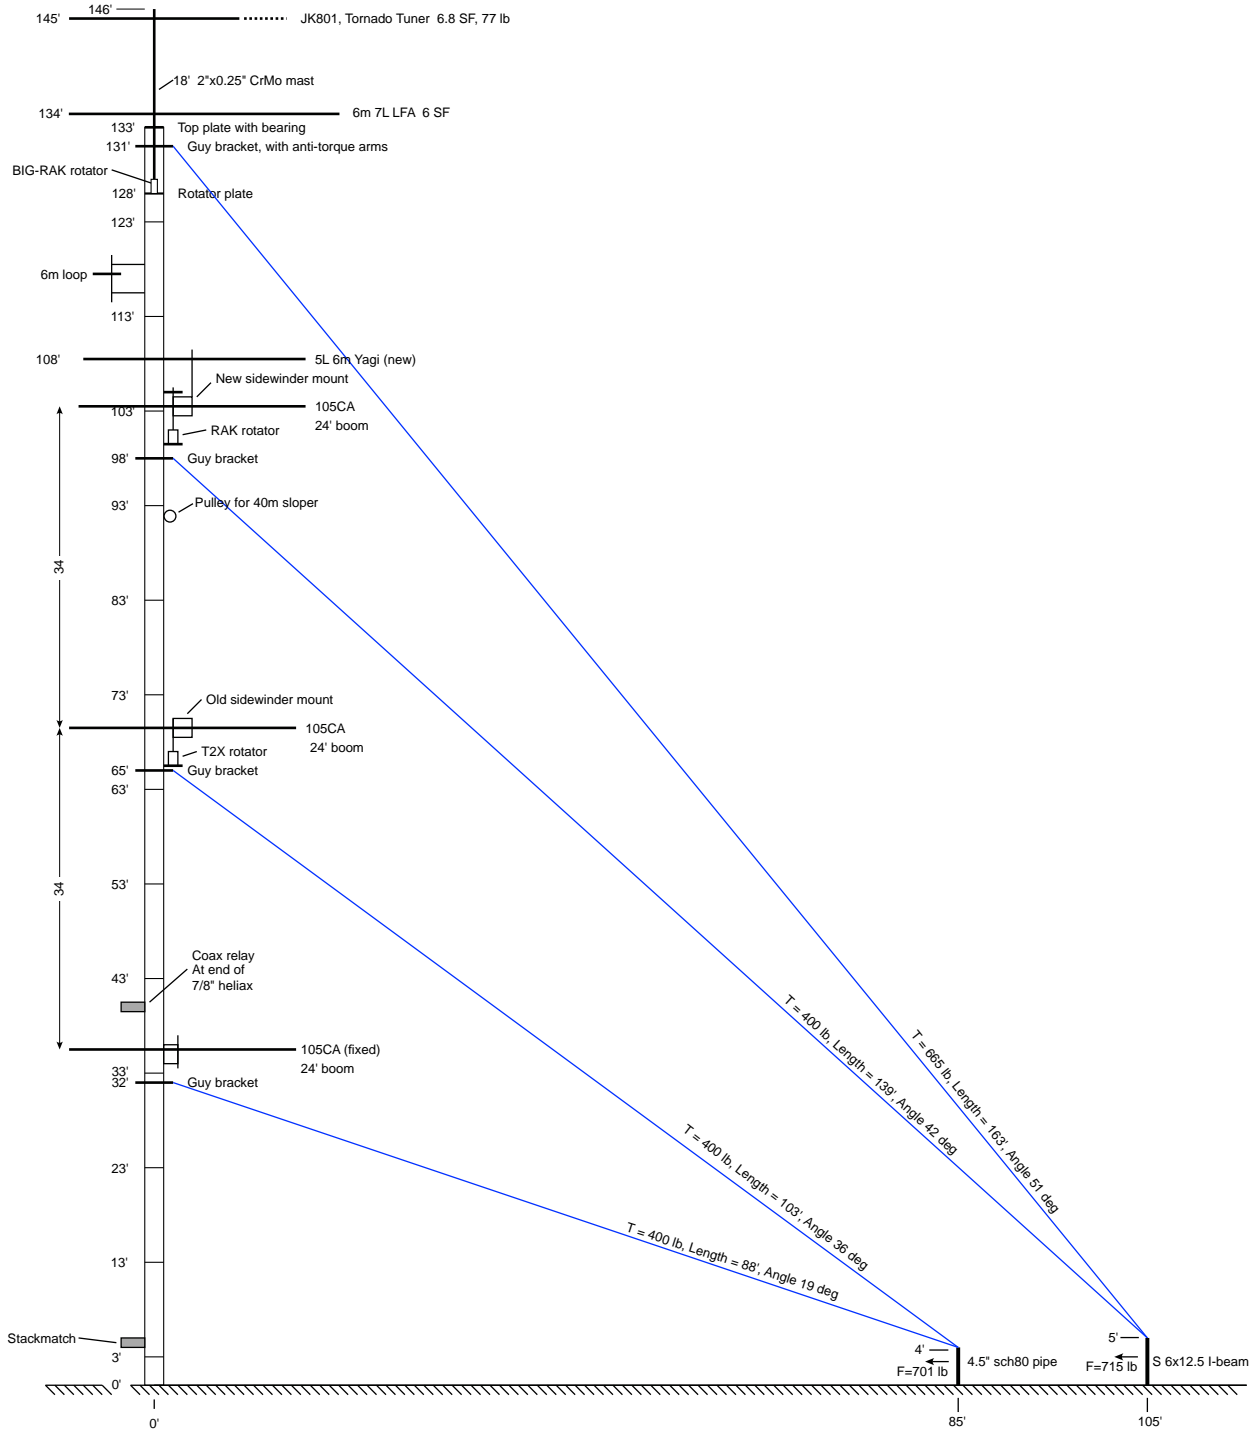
Tower elevation. This scaled drawing is the foundation of the entire project.
